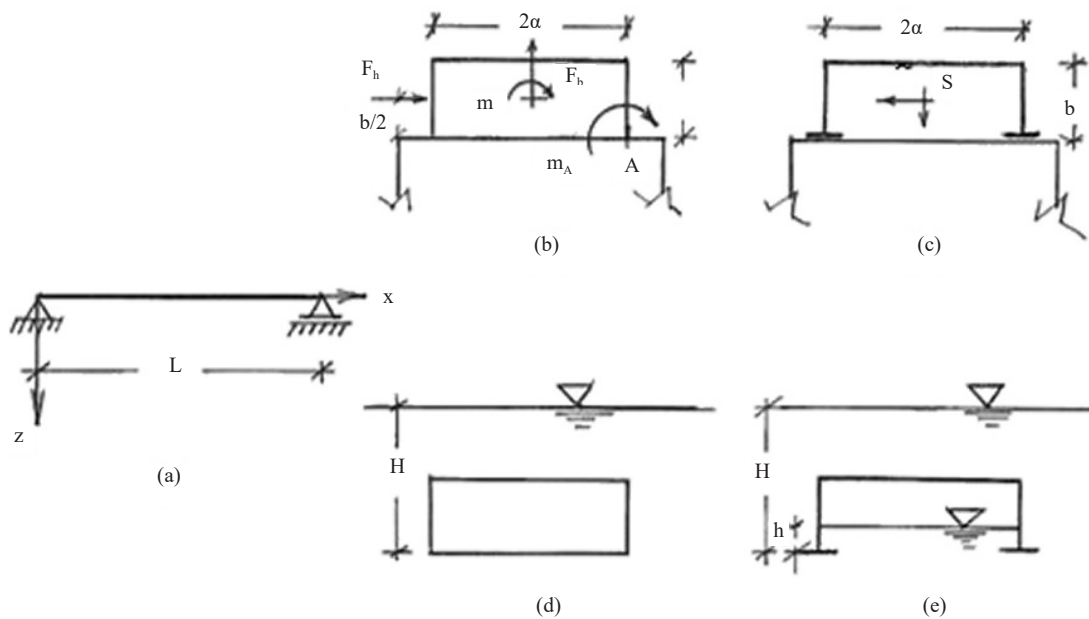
(a) Single-span bridge, (b) closed cross-section, (c) open cross-section, (d), (e) buoyancy forces
